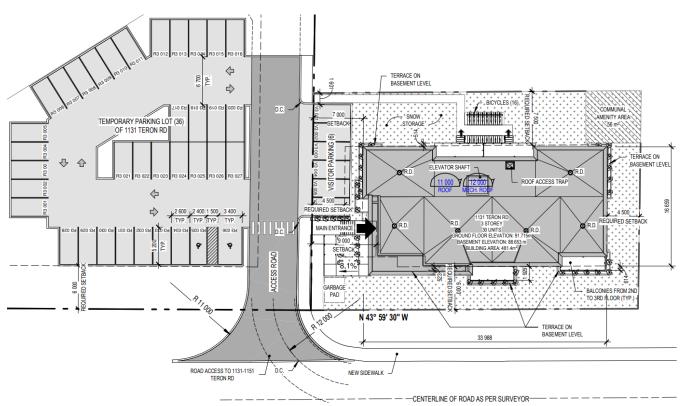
Excerpt from the Site Plan of Phase 1 of the proposed development
